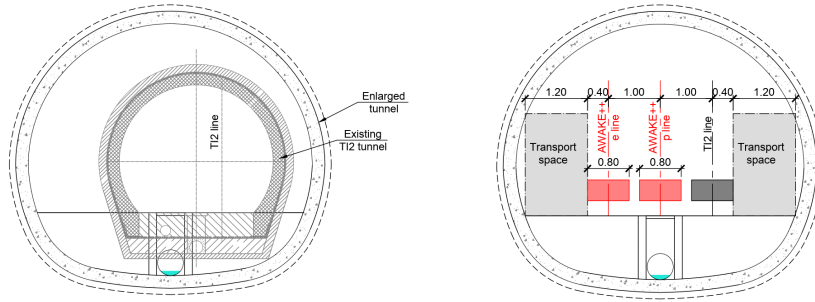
Typical cross-sections showing existing TI2 and widened tunnel profiles required (left) and the proposed beam-line arrangement necessitating changes (right)
